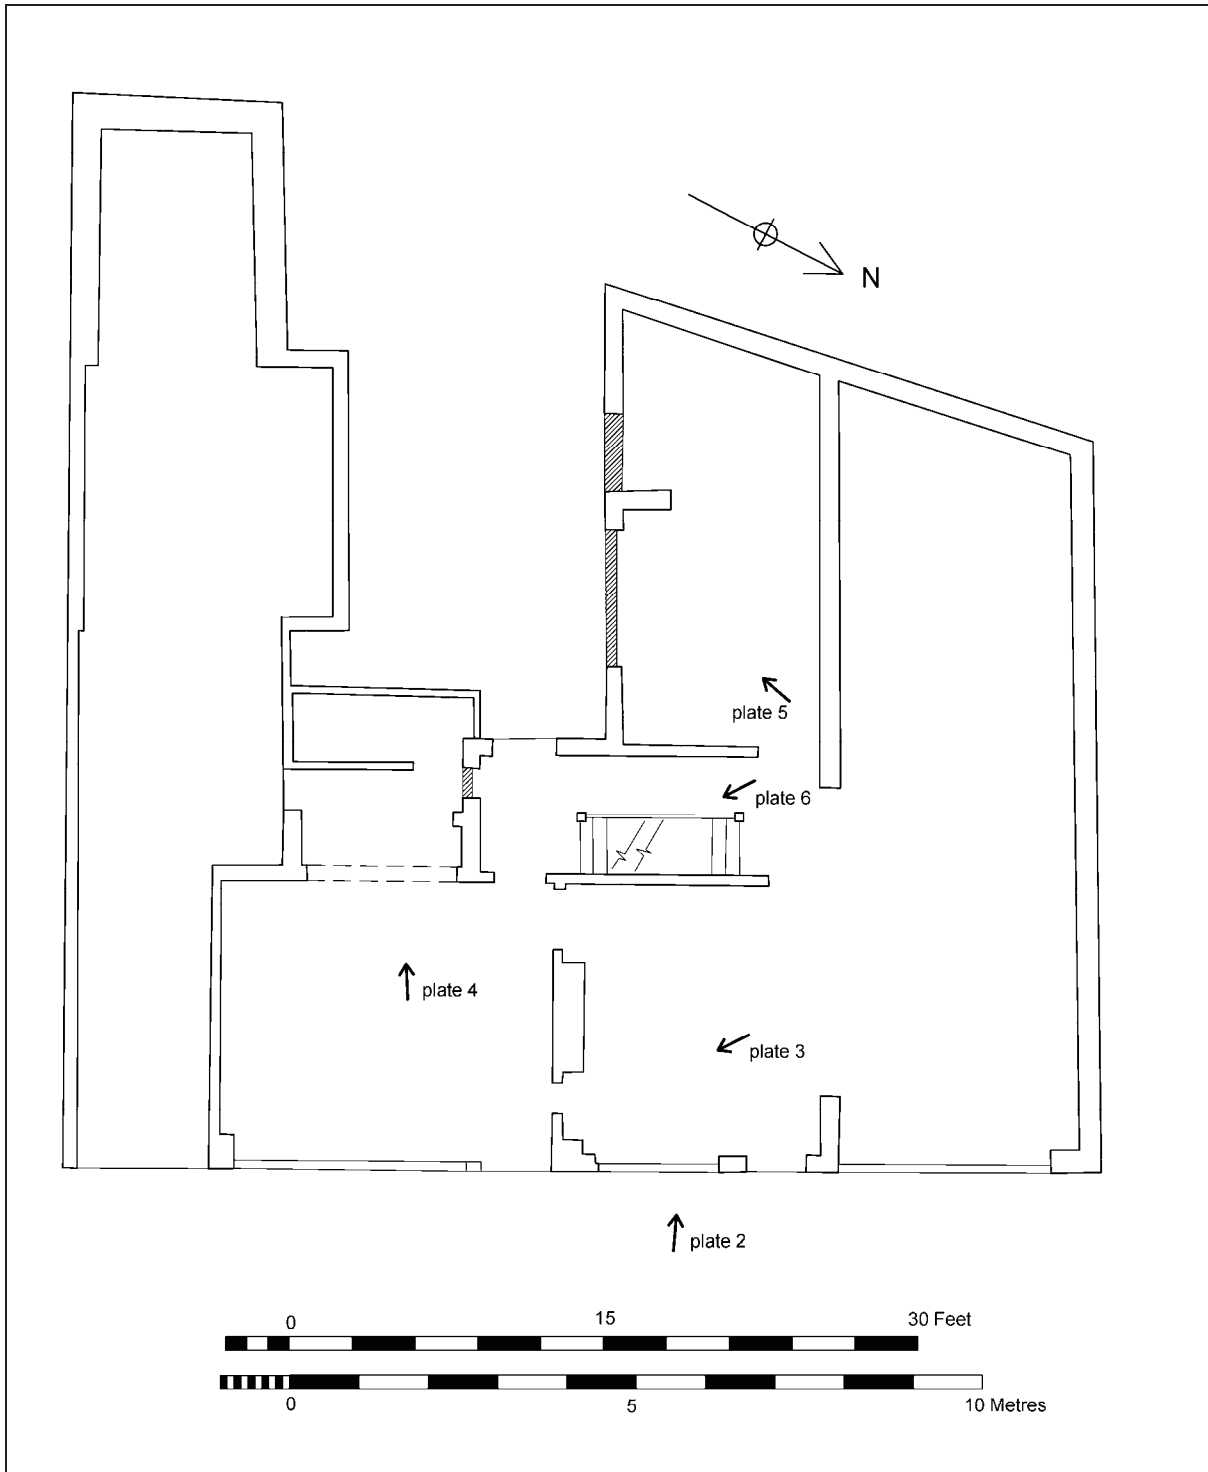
No. 4 Northgate Street, ground floor plan with locations of plates added.
